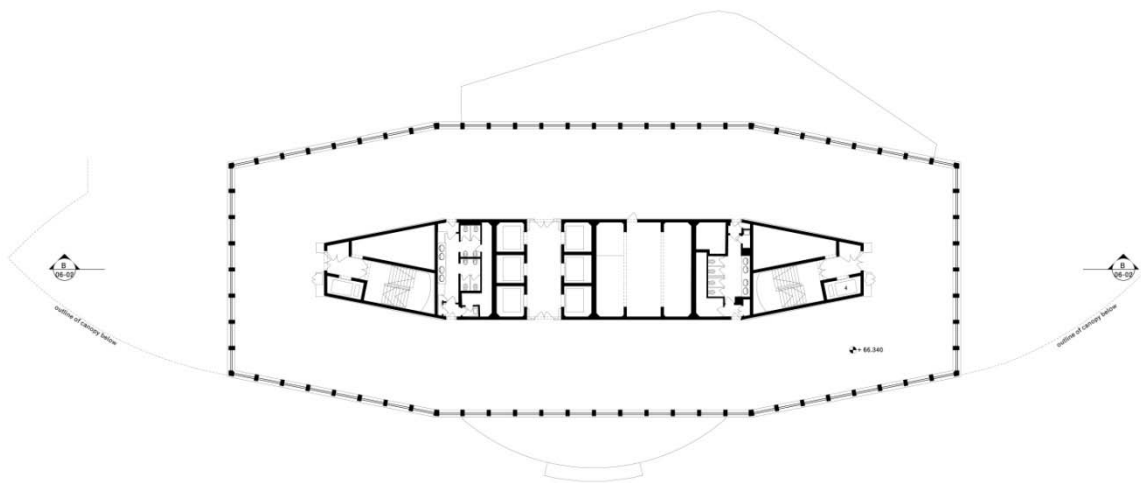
Portland House, Typical Floor Plan 2, Existing (DCA, 2013)
